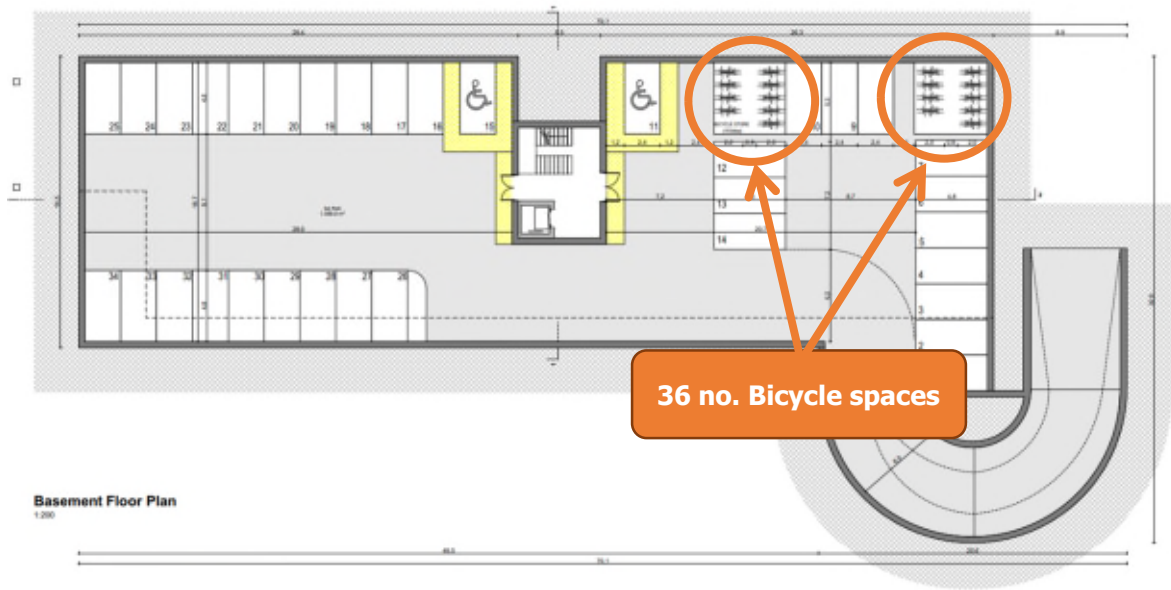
Proposed Block L Basement Car Parking Layout (Delphi Architects drawing no. D1408-19-PA18-CA5)
